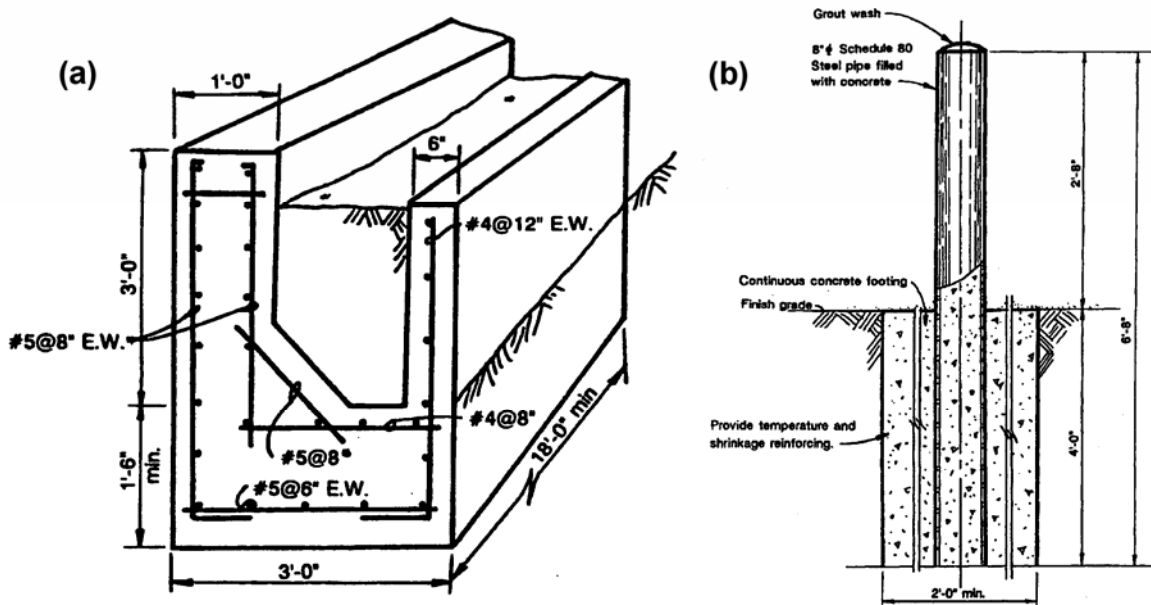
Passive barriers: (a) concrete planters construction; (b) bollards construction (US Army, 1994).
